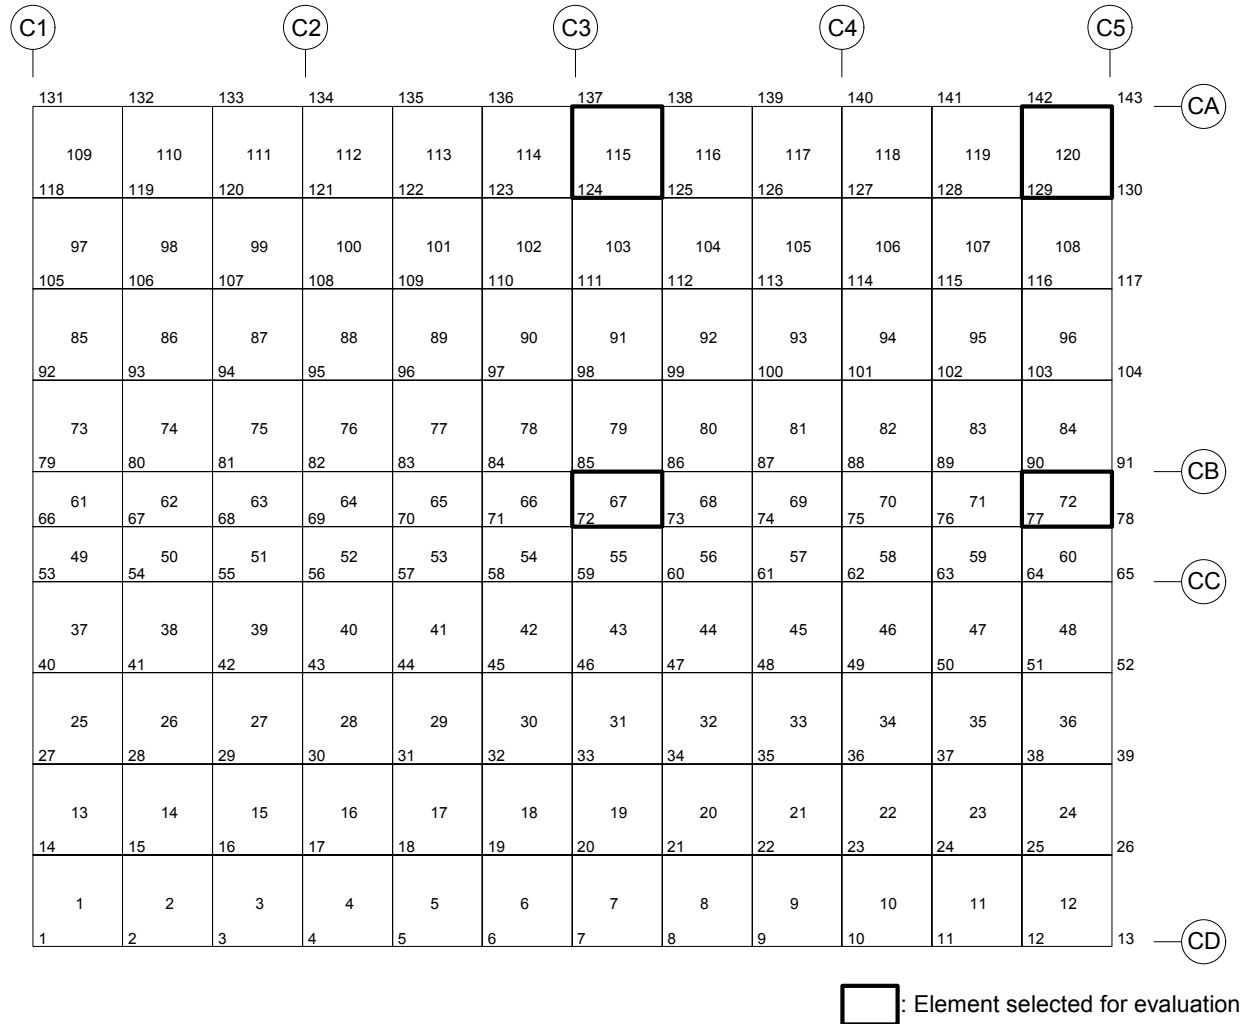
G.2-5. FE Model of CB (Foundation Mat)
